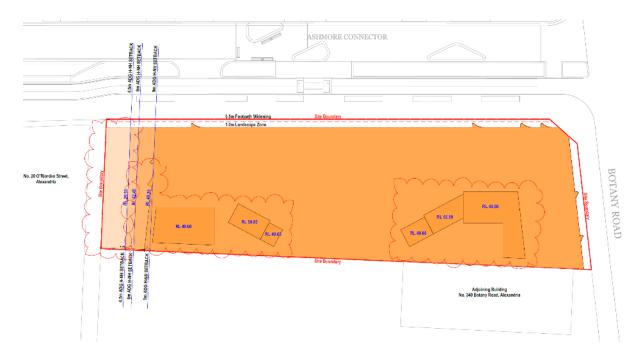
Proposed Overall Envelope Plan (Note: changes as above and shows maximum height of plant)
